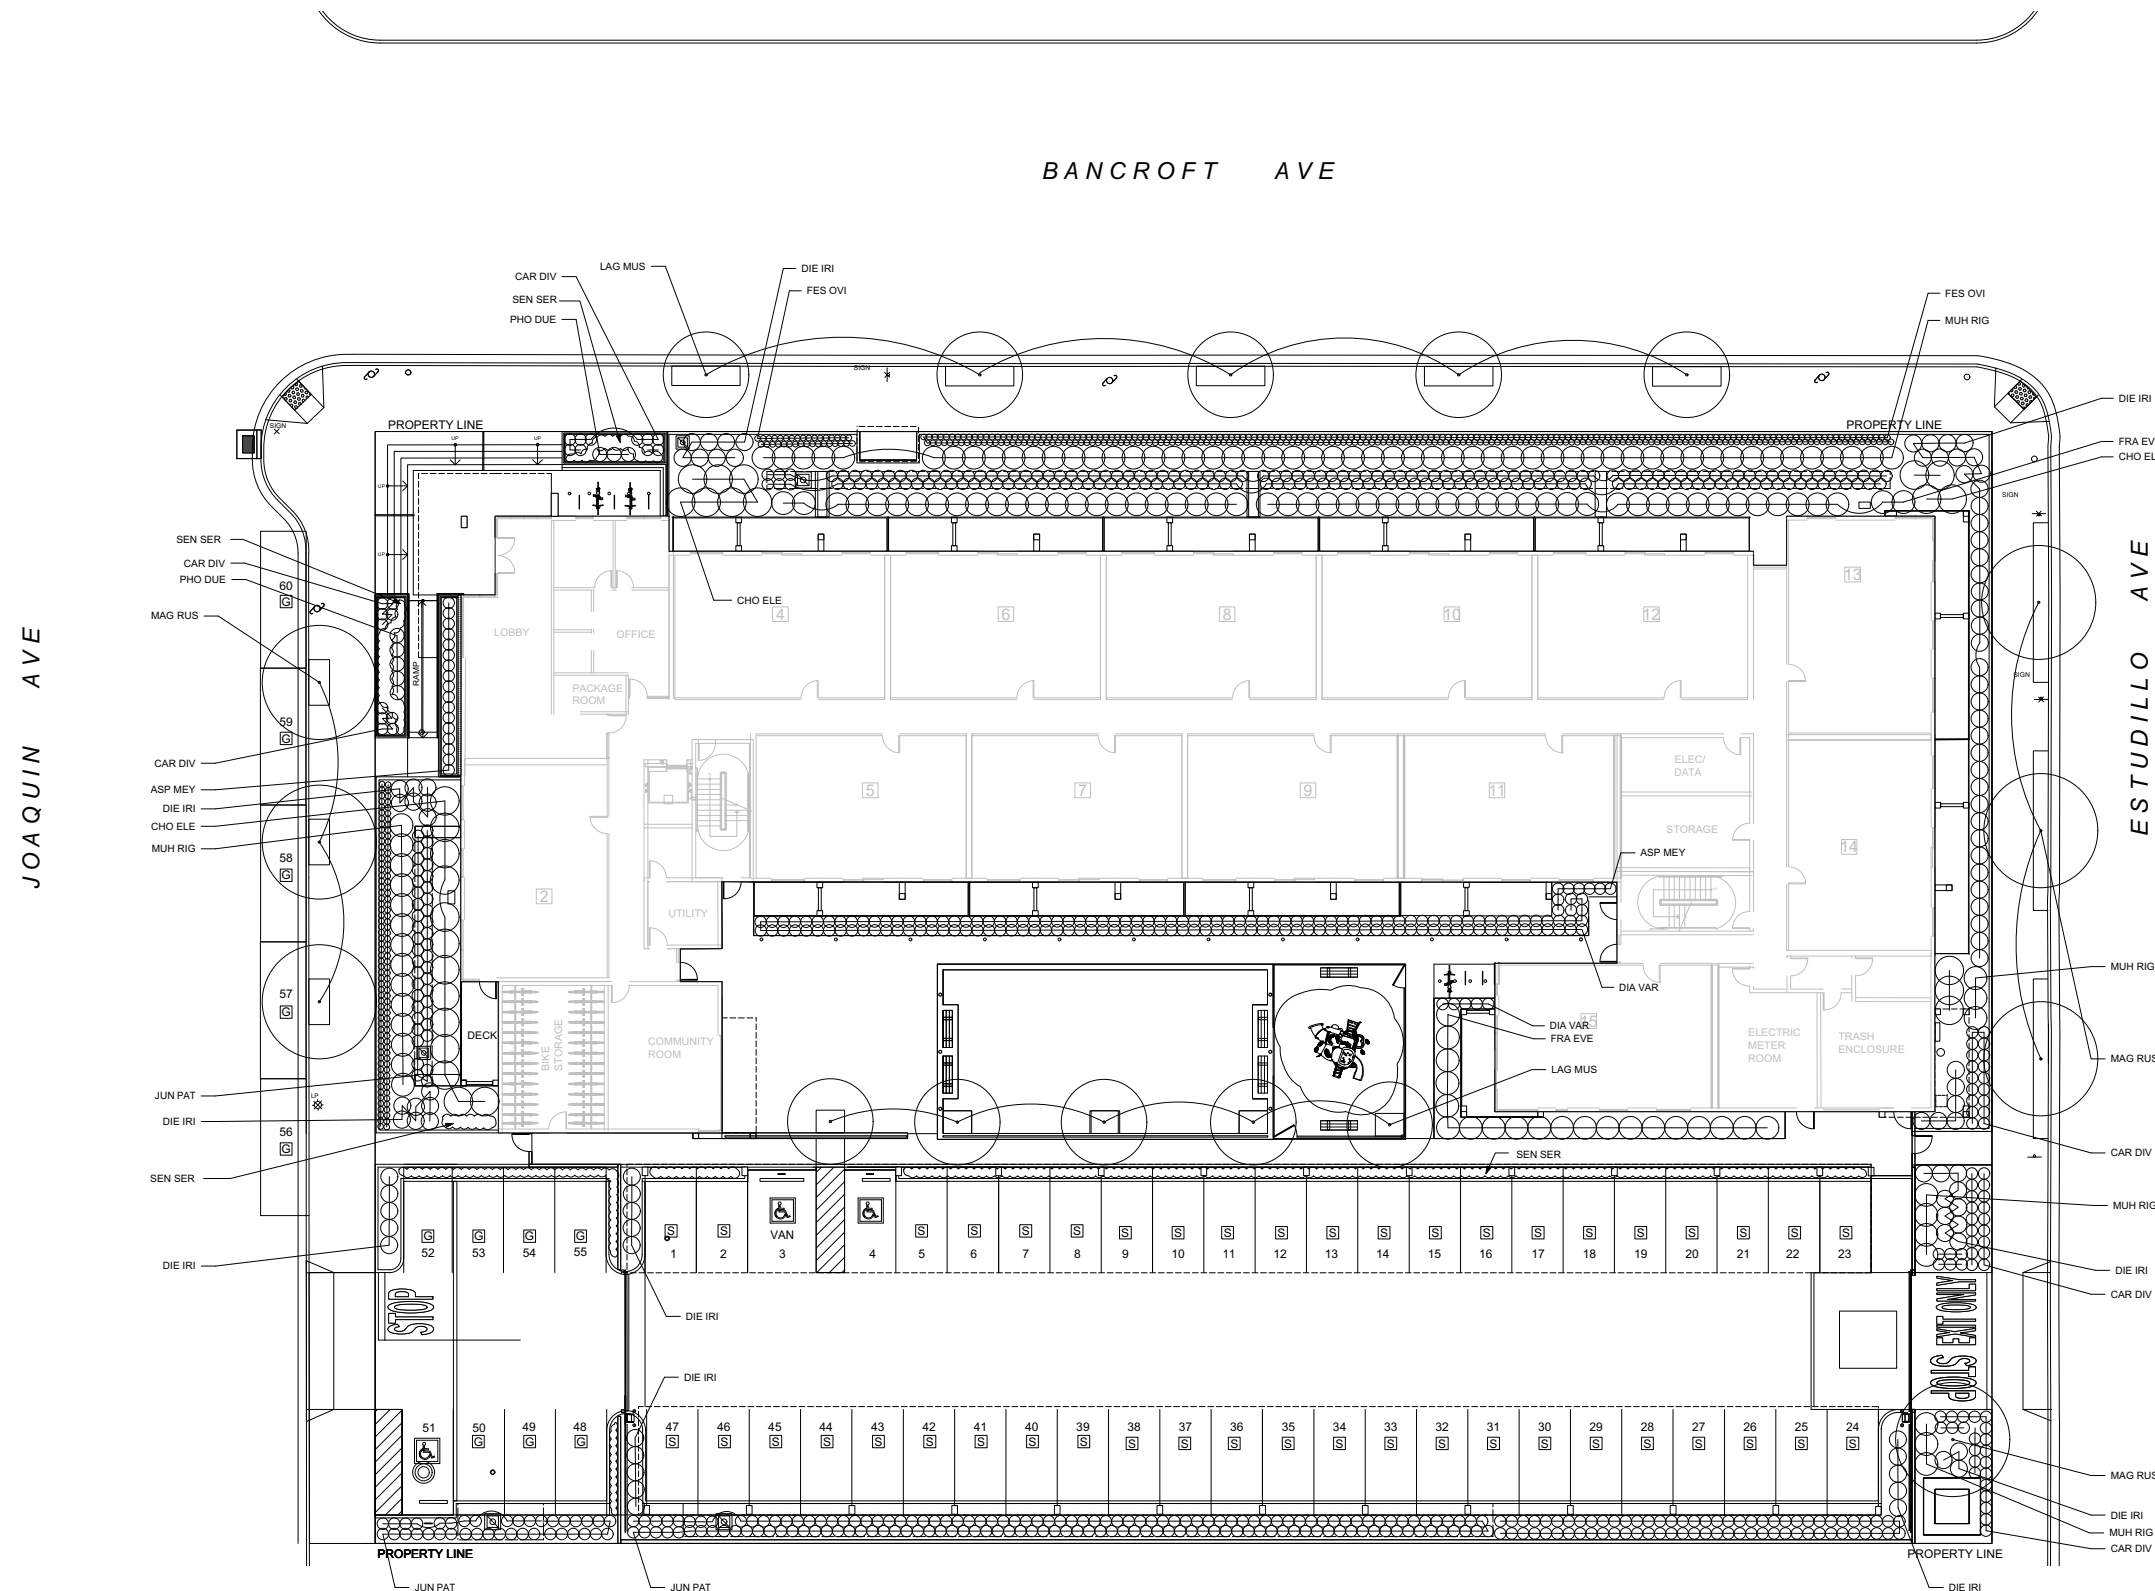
EXHIBIT R - PLANTING PLAN - GROUND FLOOR
